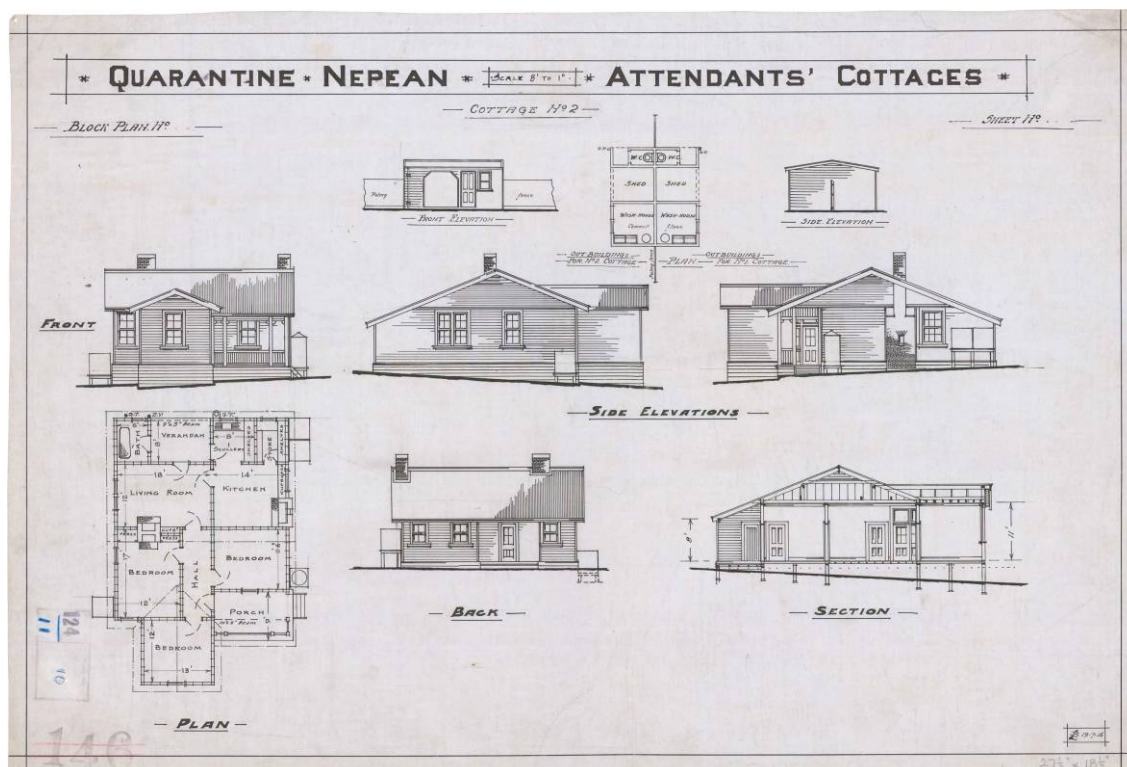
Attendants' Cottage No. 2 plan, July 1916.
